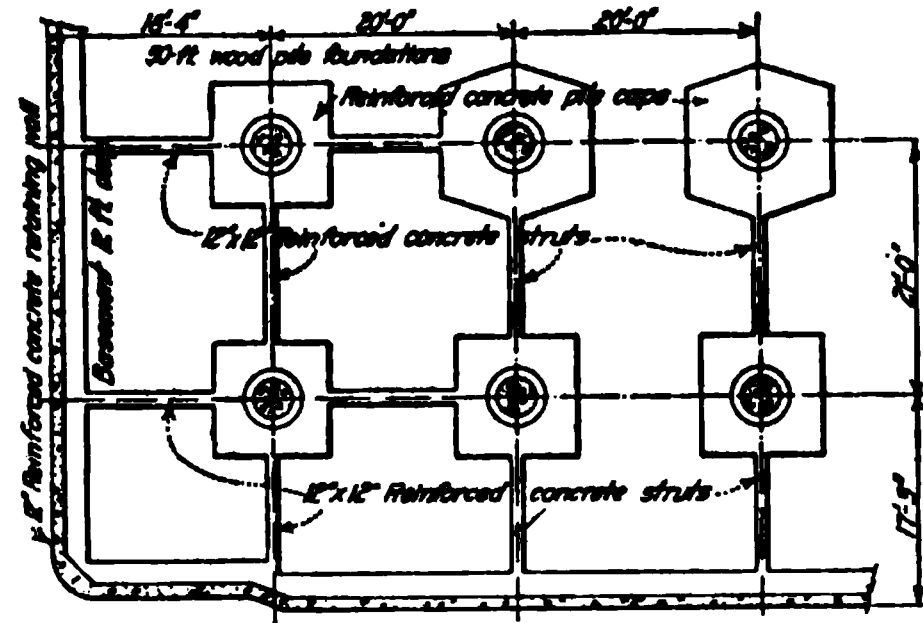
Part plan of retaining walls and foundations showing concrete struts from footings to retaining wall, Union Special Machine Company building, Chicago, Ill.
